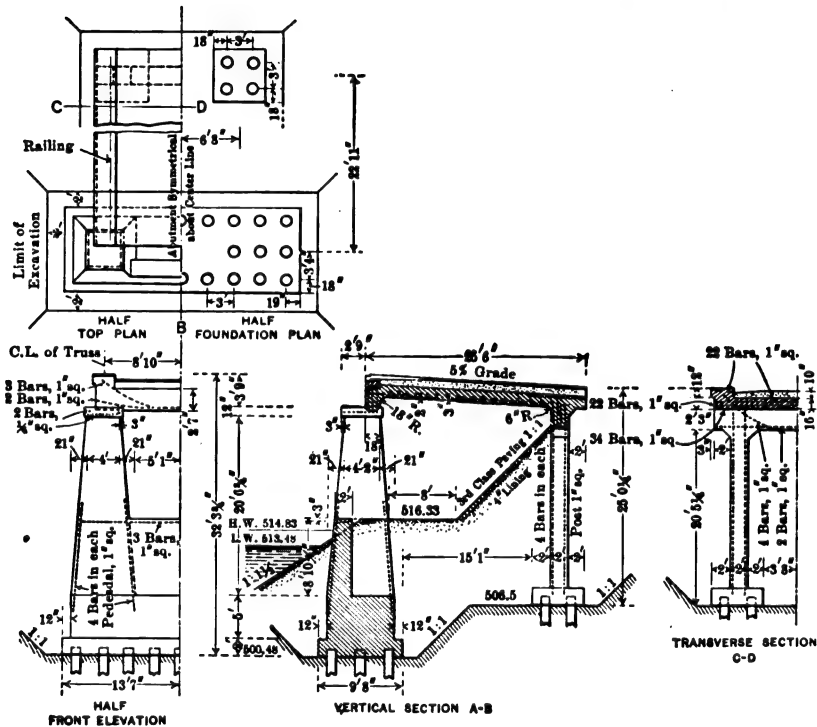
PEDESTAL ABUTMENT ON BARGE CANAL.
